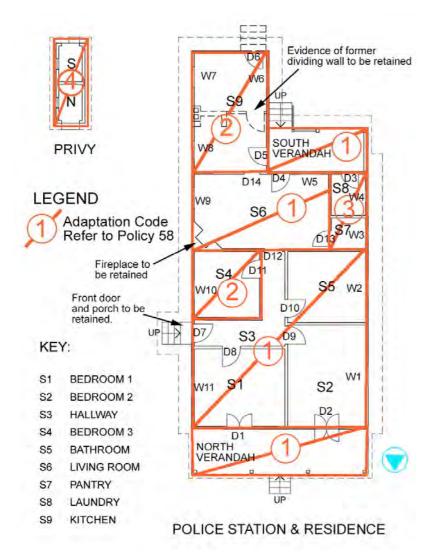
4: Adaptation plans for the interior spaces of the main building and the privy.
